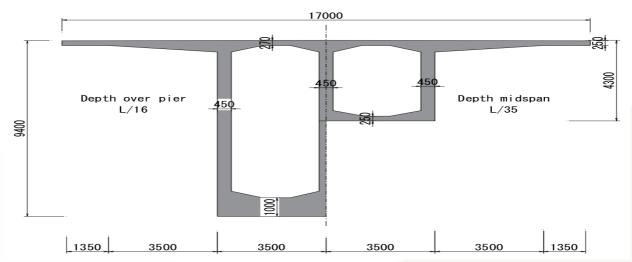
Typical Bridge Cross Section of proposed Laropi Bridge where the proposed Road project starts.
